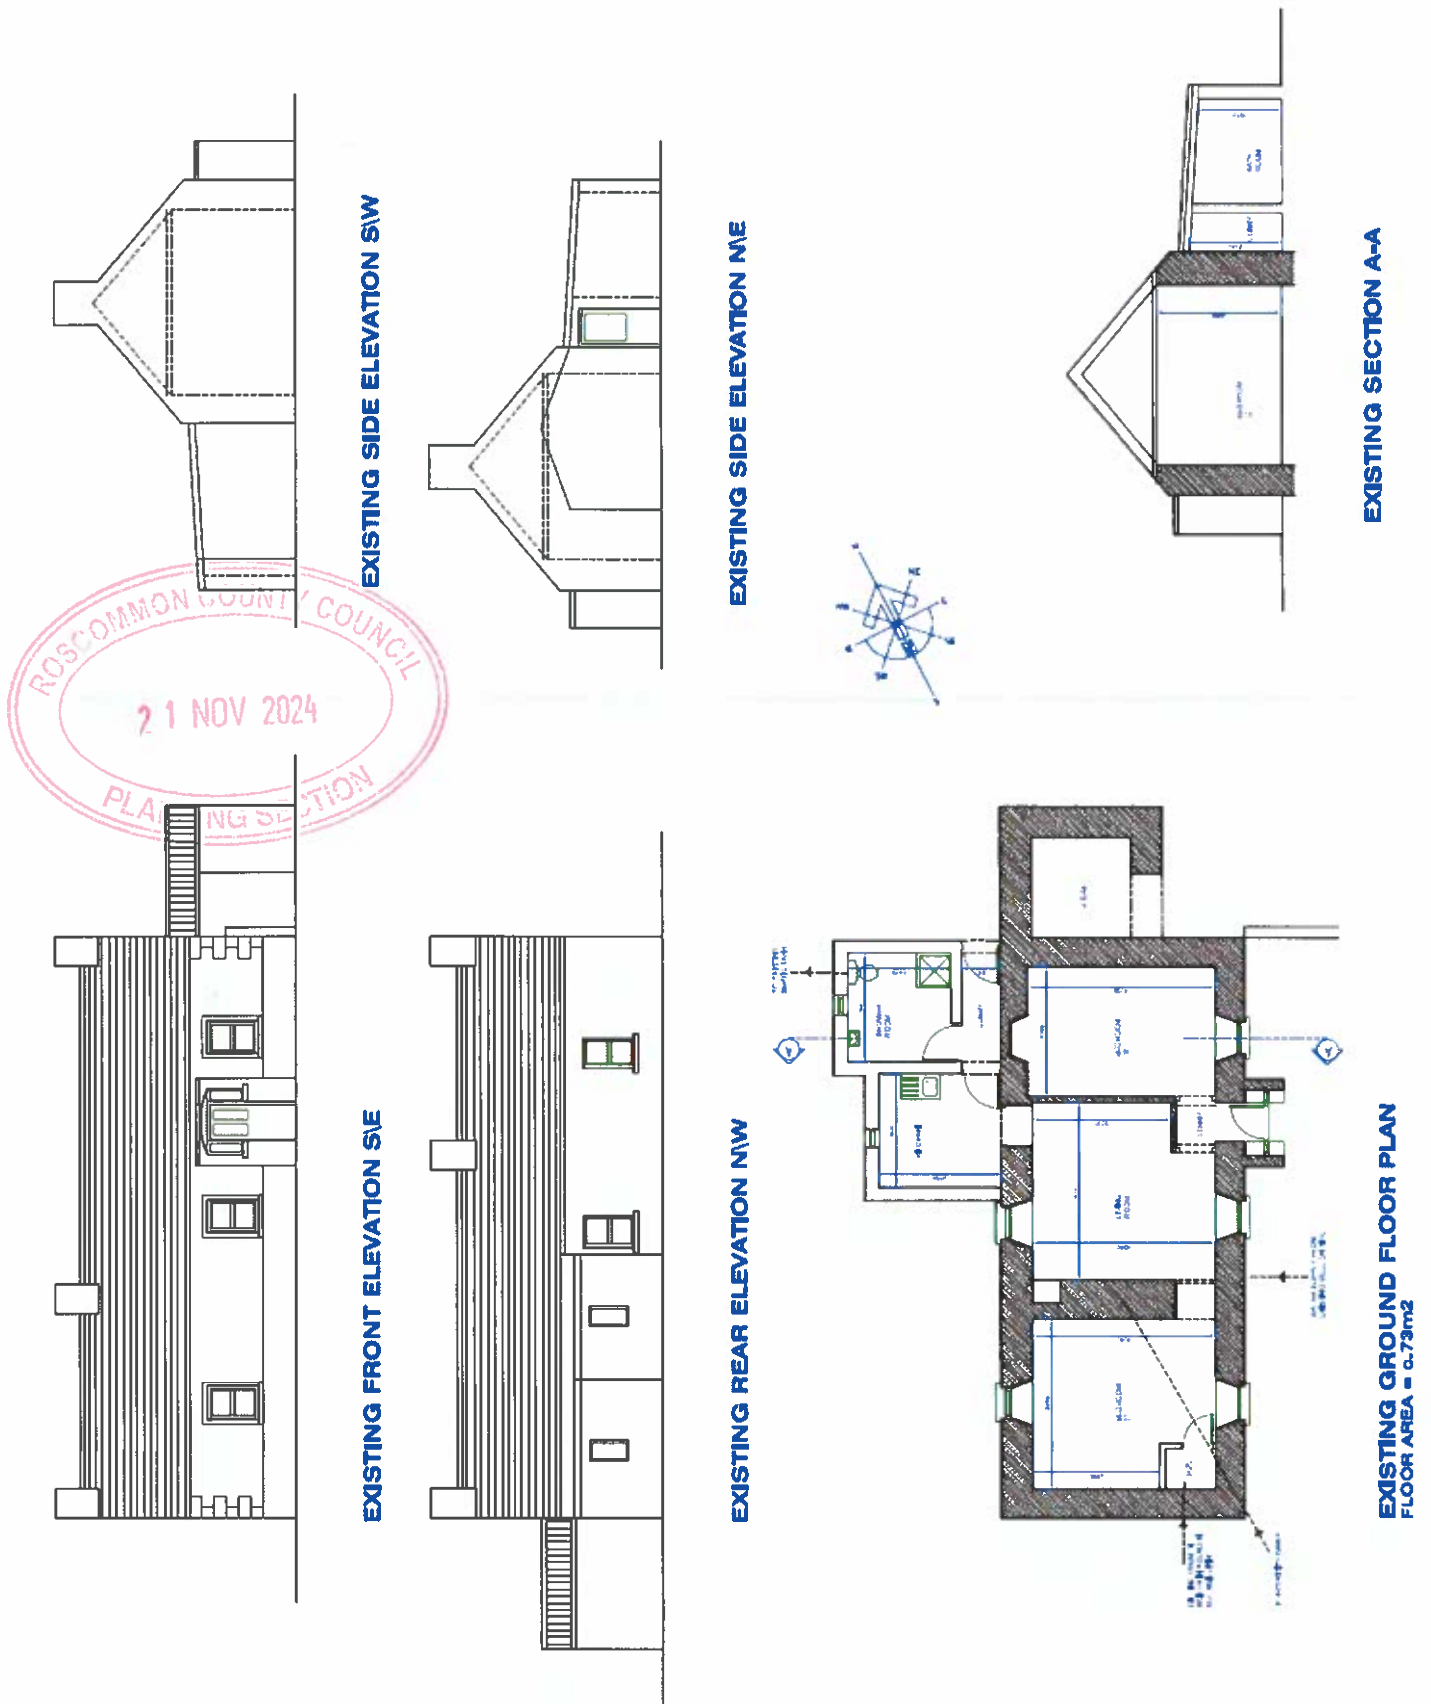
Survey drawings of Existing Floor Plan, Elevations, Section A-A.
